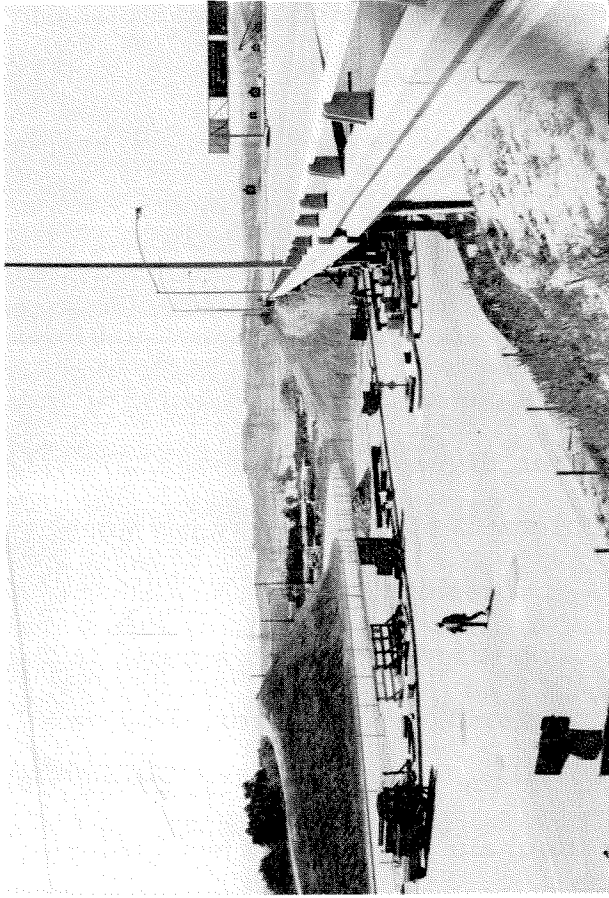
Looking southwest along the Foothill freeway at the Foothill Boulevard undercrossing. Note bridge offset.
